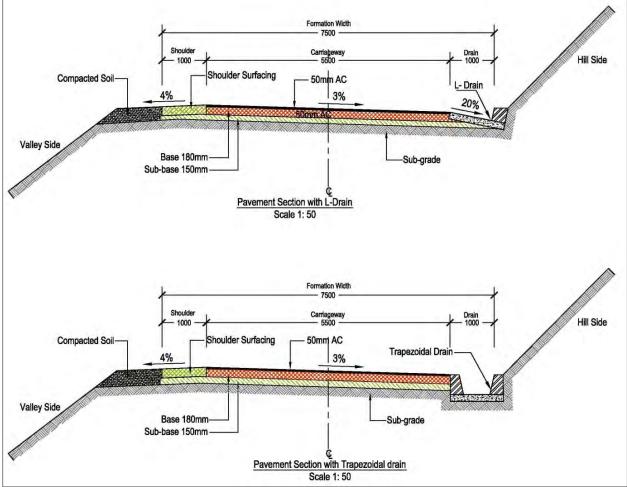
Road and Pavement Cross Sections for Nganglam-Dewathang Road
